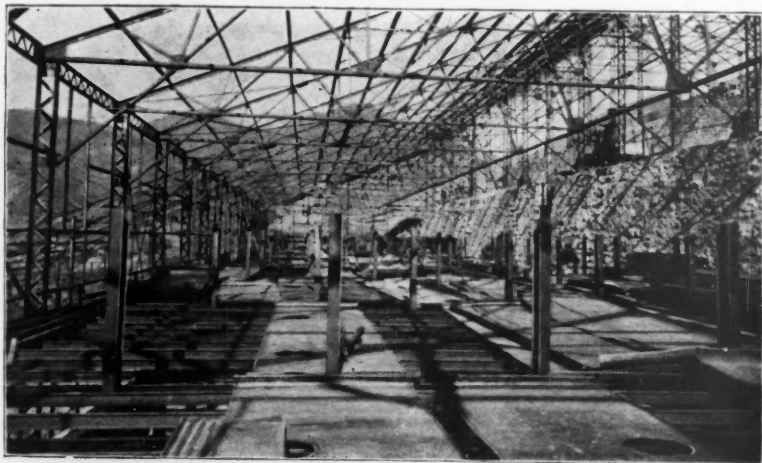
ROOF TRUSSES OVER TANK ROOM.
